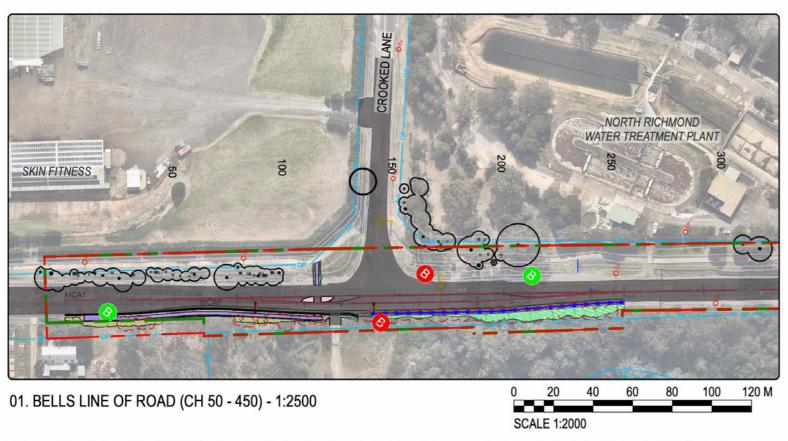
Stage 2B urban design plans - sheet 1 of 3
